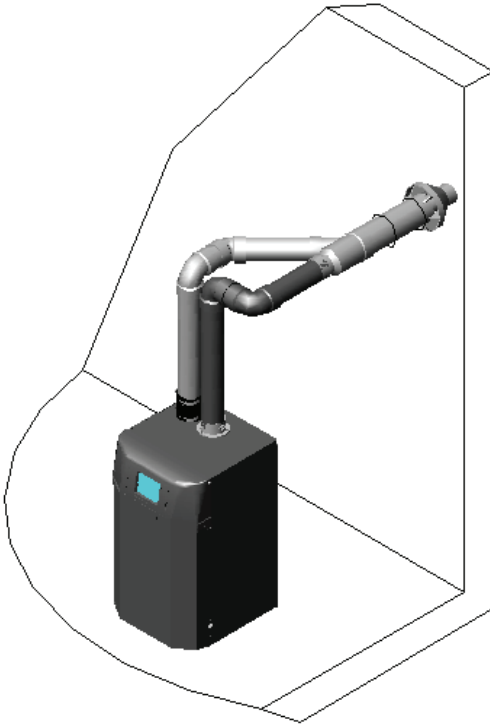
(b) Two-Pipe Sidewall Termination (NX200 Illustrated)
